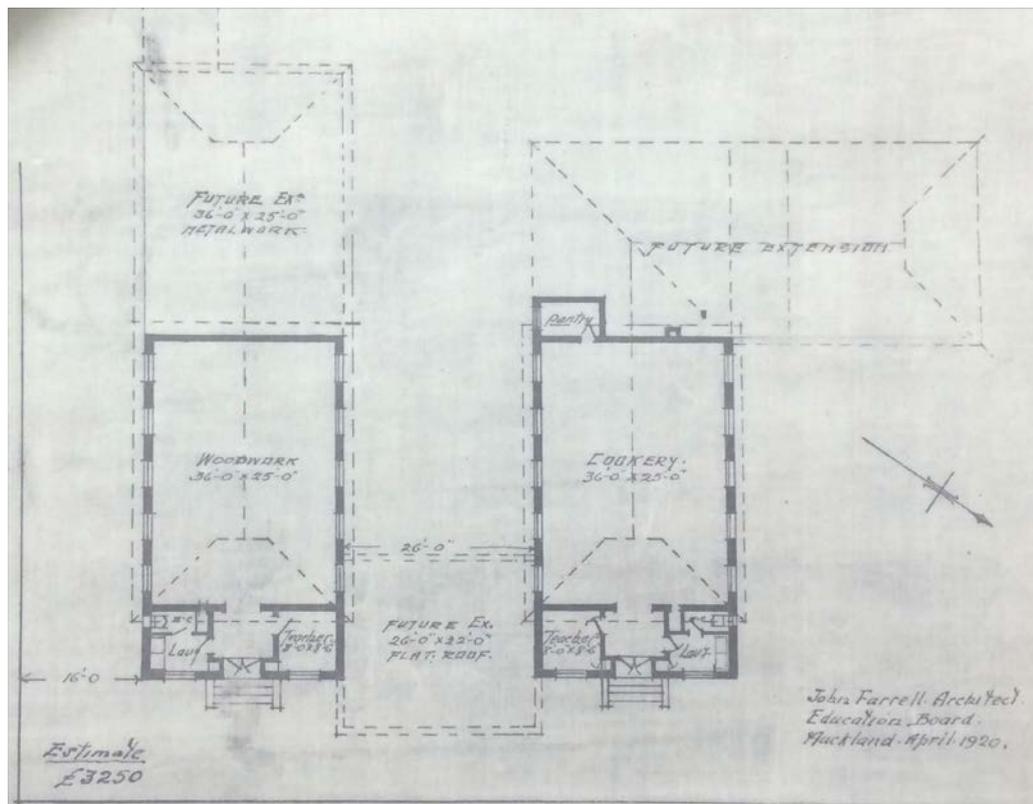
Final drawing by John Farrell in 1920. Shows a plan of the building and possible future extensions. The future extensions were never built. (Education Department. (1919-1981) Buildings and Sites - Onehunga Manual Training Centre (R22887276) at Archives New Zealand)
